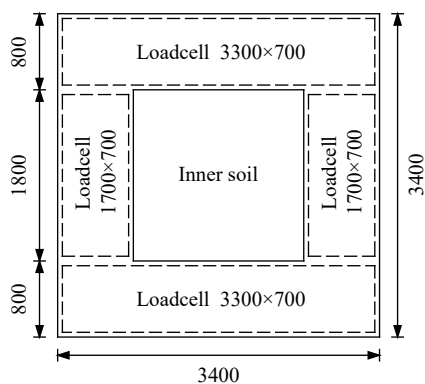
Enclosed rectangular diaphragm wall (unit: mm)
